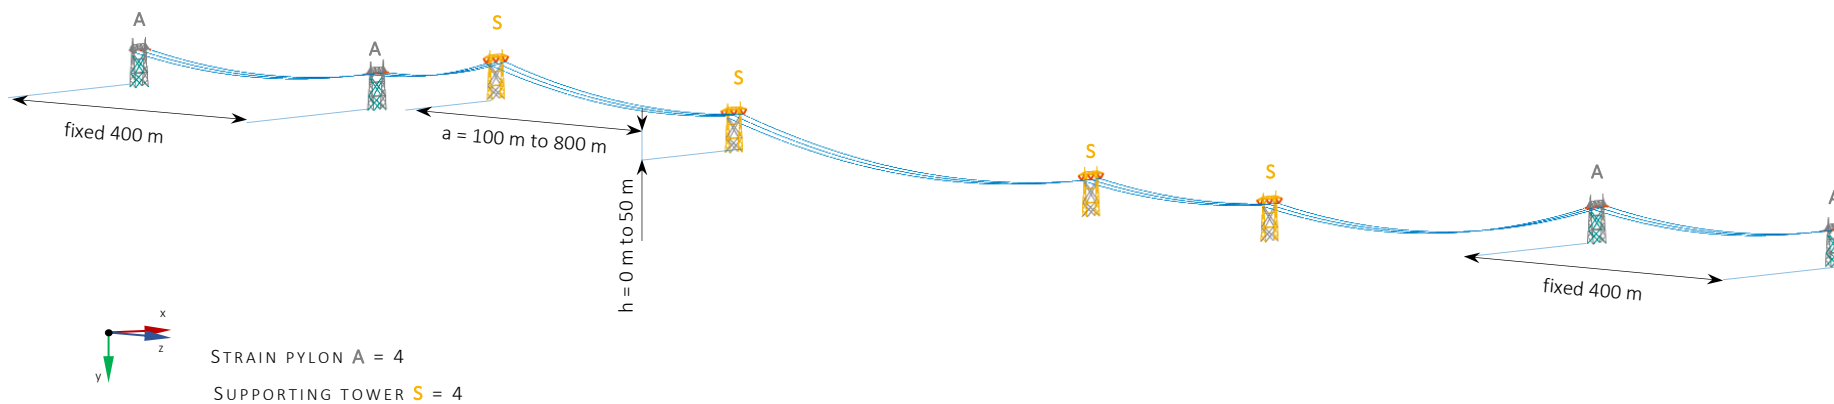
EXAMPLE POWER LINE SECTION FOR 4 SUPPORTING TOWERS (MATLAB PLOT)
